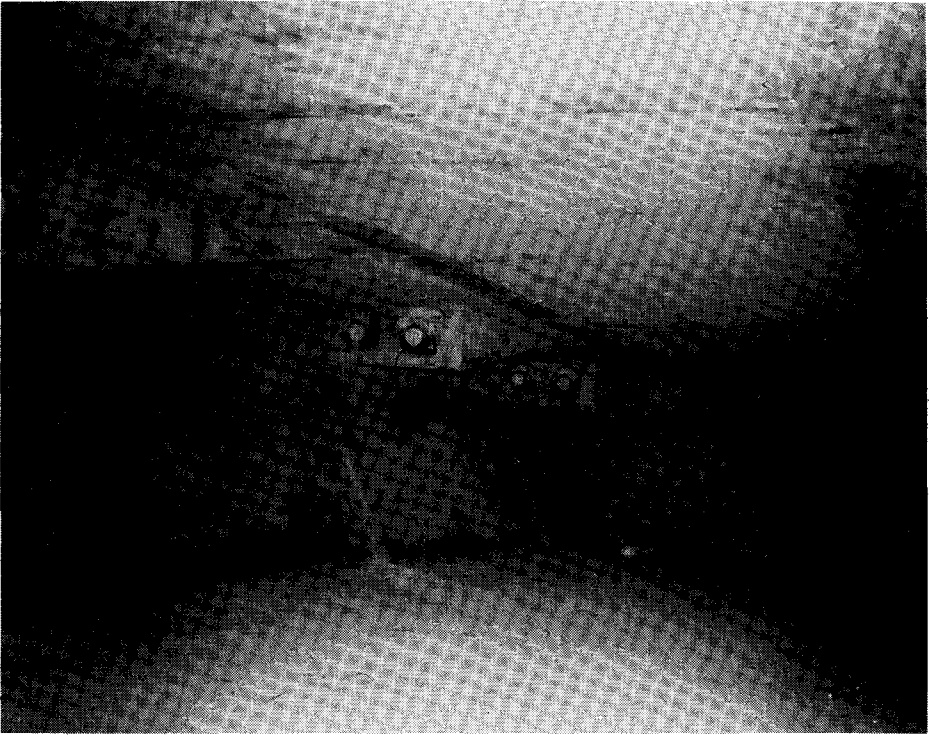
Build-outs at stressing ends of longitudinal deck slab tendons, San Diego River Bridge, California.
